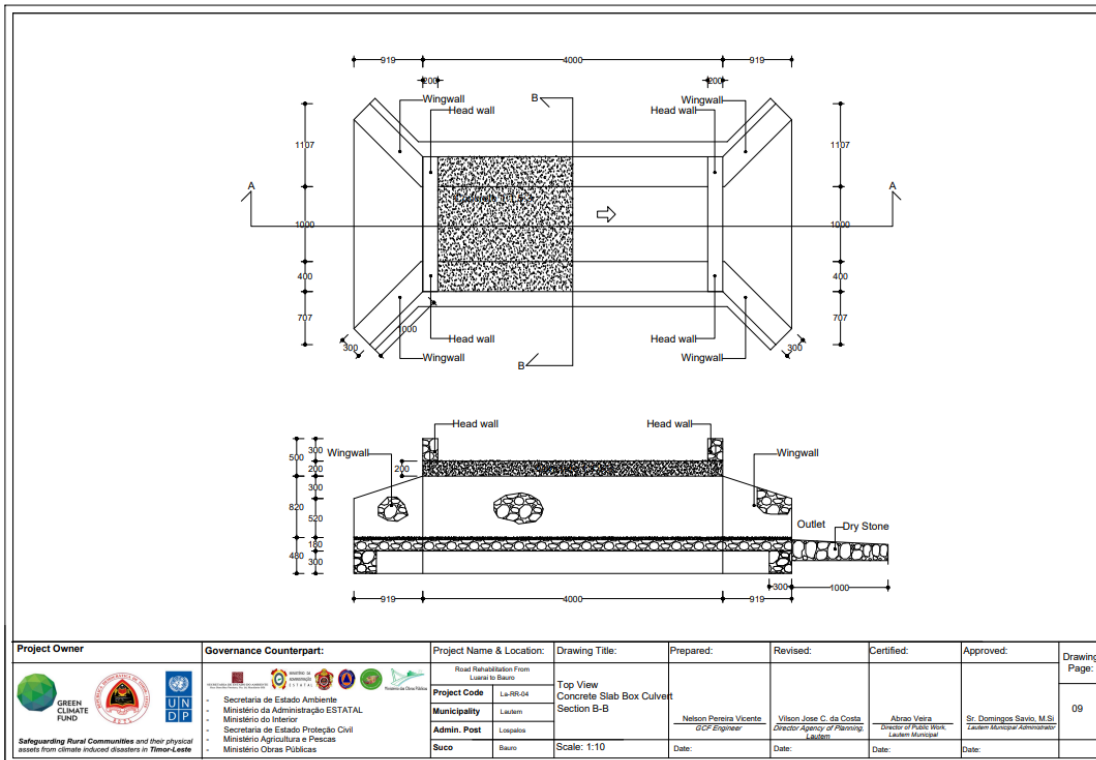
b): Reinforced Concrete Box Culvert (cross-section)
